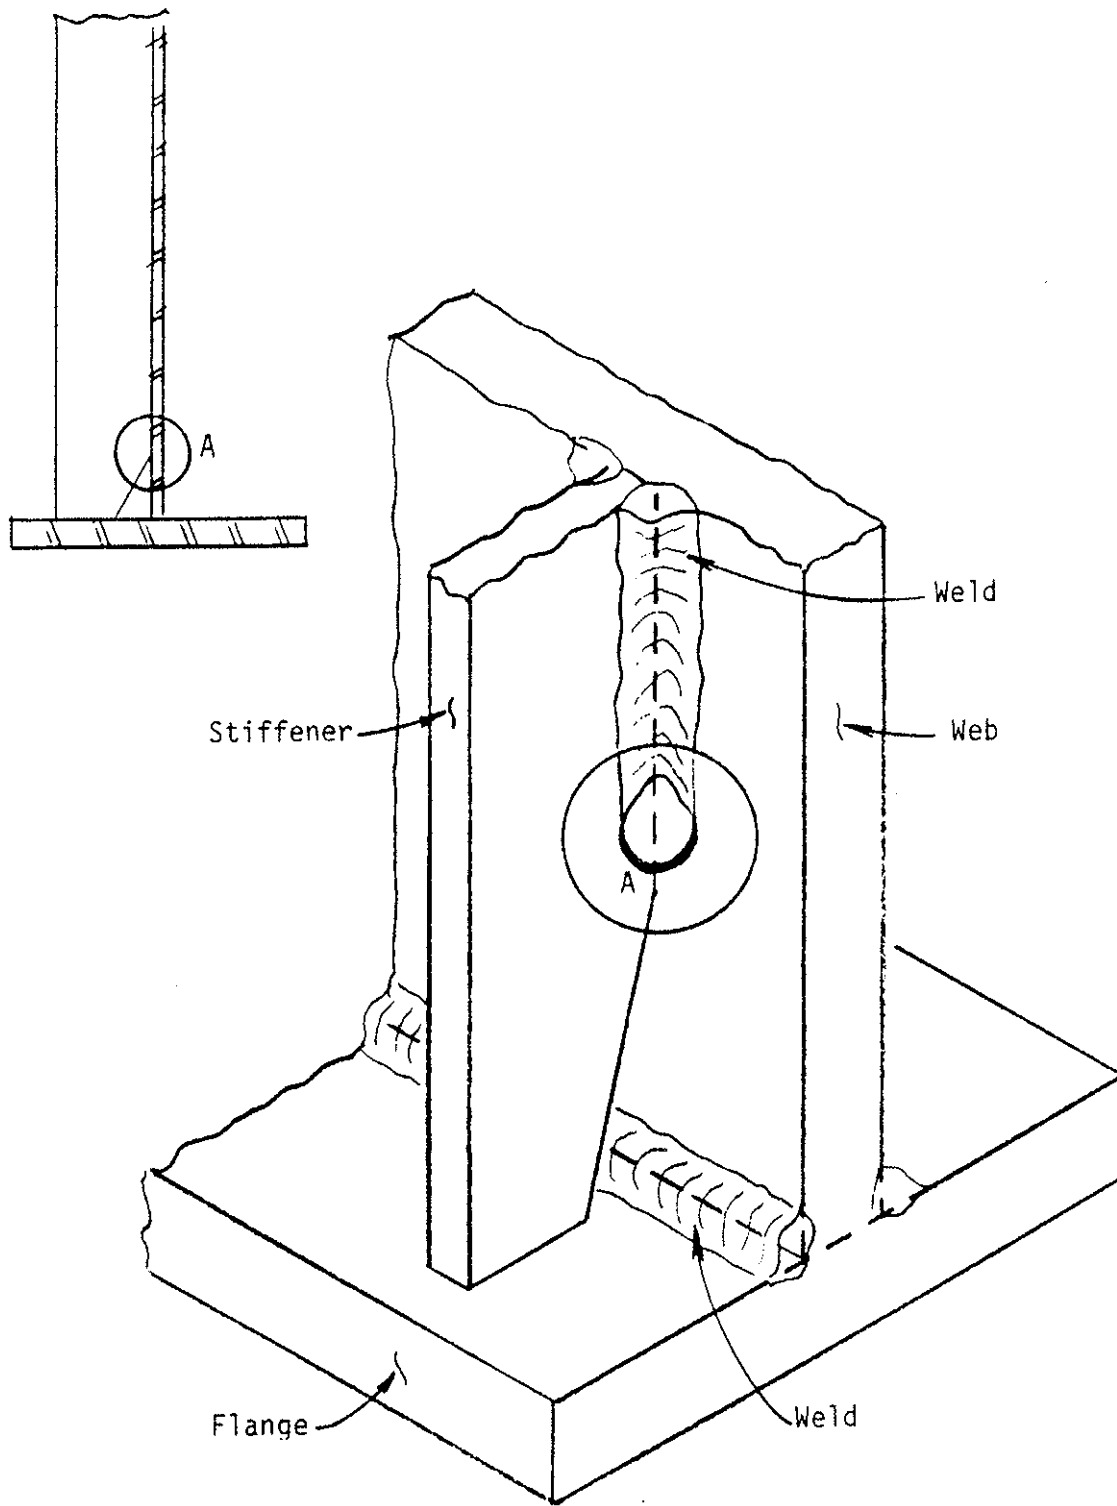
Fillet Weld Termination Above Stiffener Cope,
